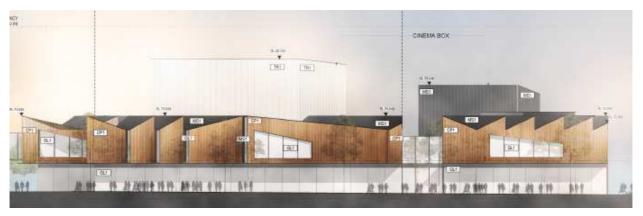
Elevation view of the Markey Hall building (Main Street)
